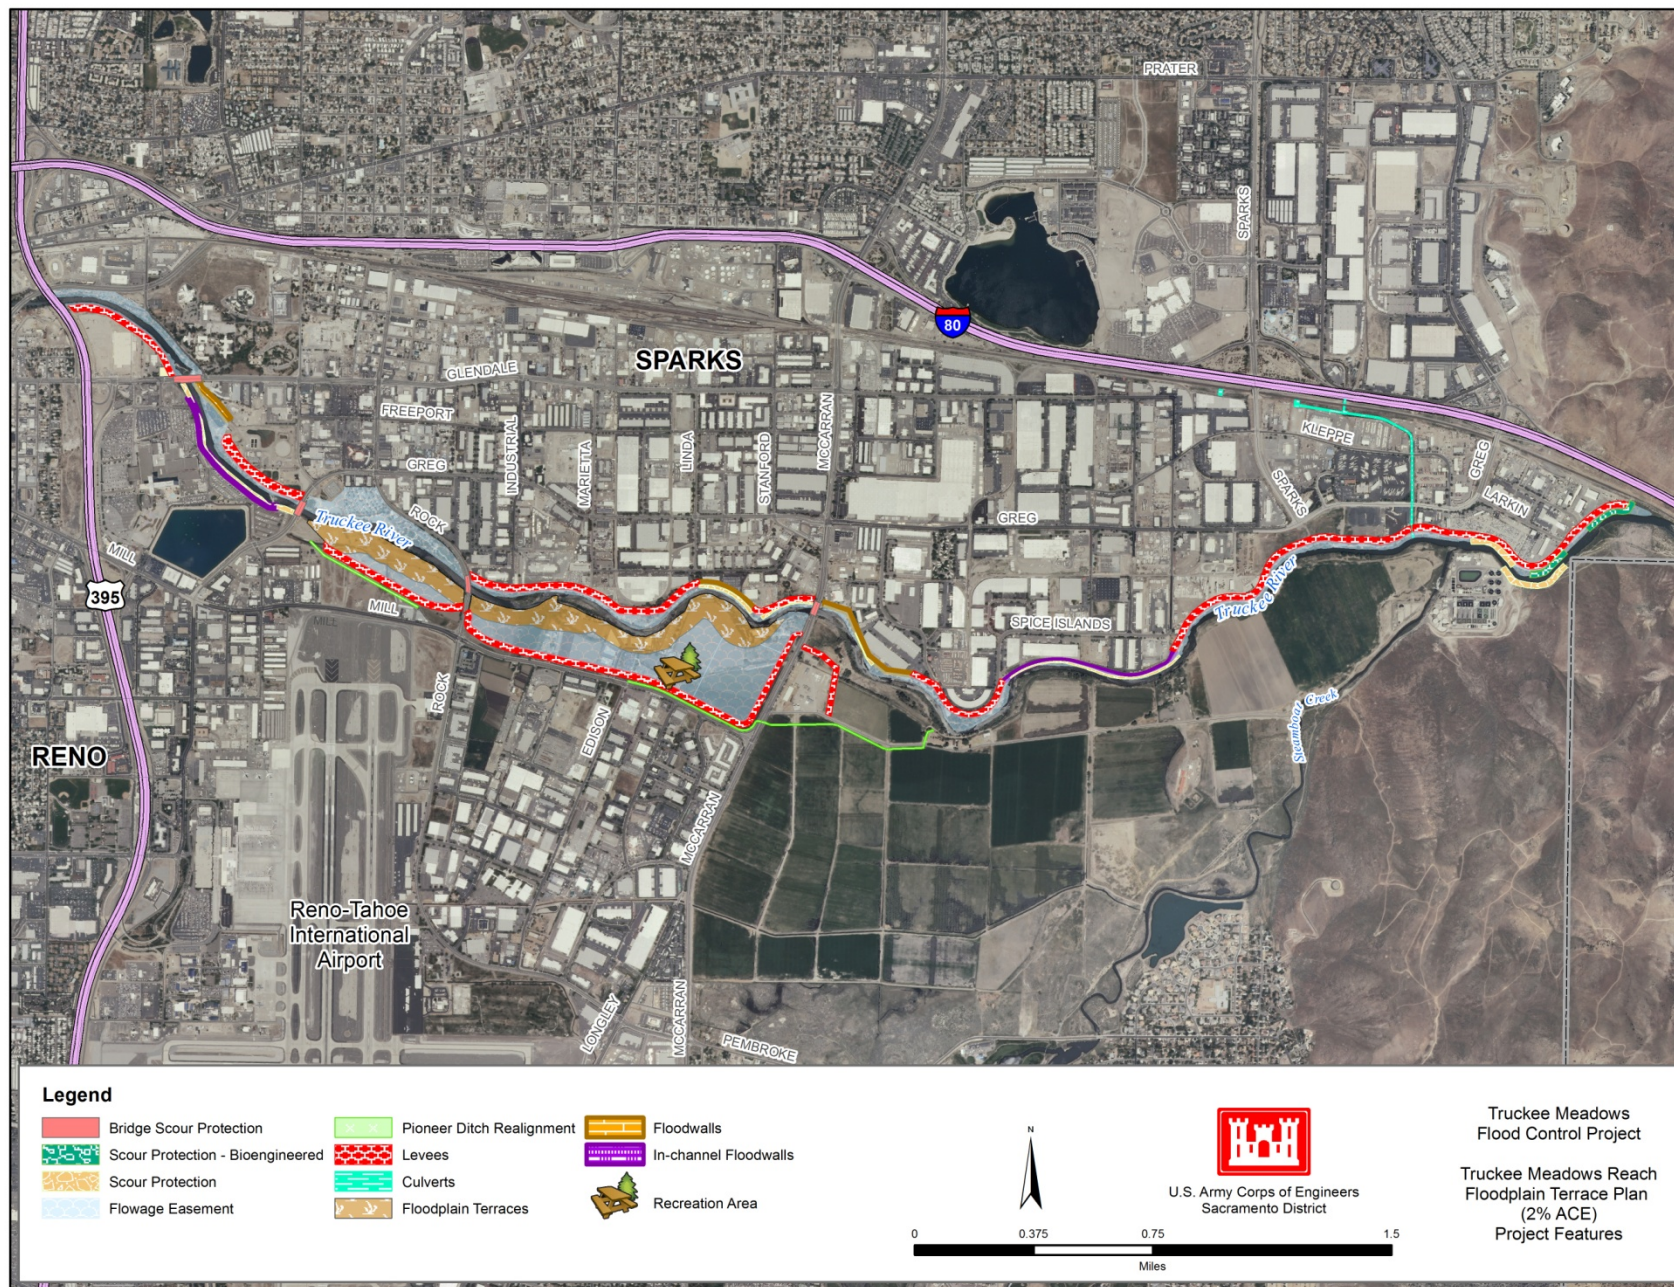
Alternative 3 - Floodplain Terrace Plan Truckee Meadows Reach
